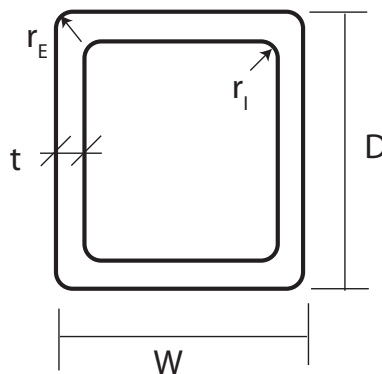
Typical Rectangular Hollow Section (RHS)
